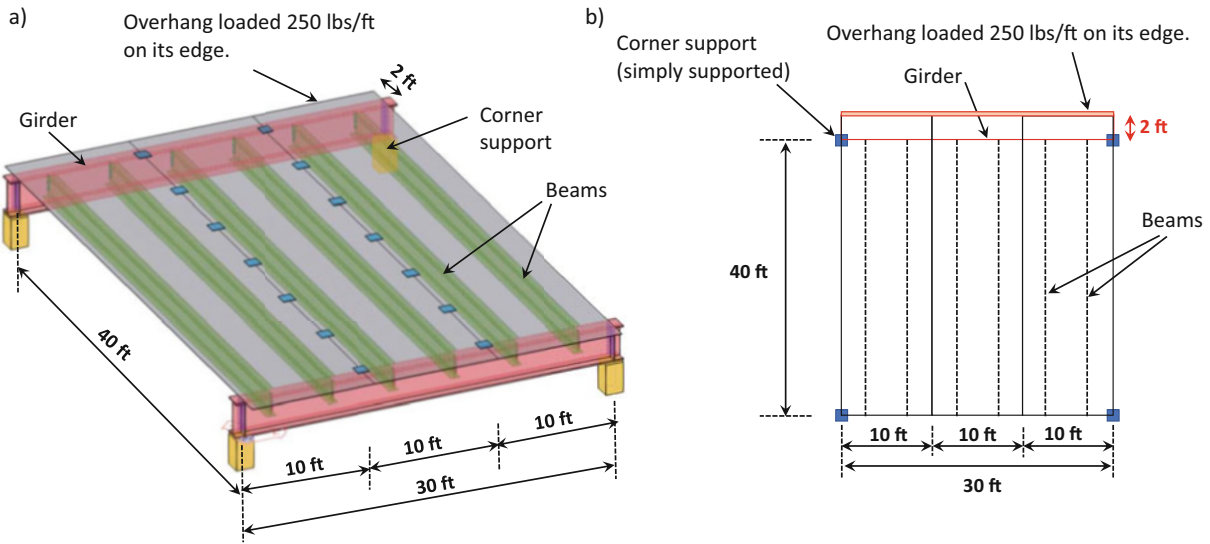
Modular steel plate assembly – full bay specimen. (a) 3D view and (b) plan view
